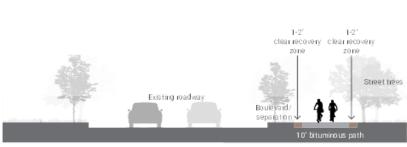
Fergus Falls GET: Adjacent to Roadway Typical Section
